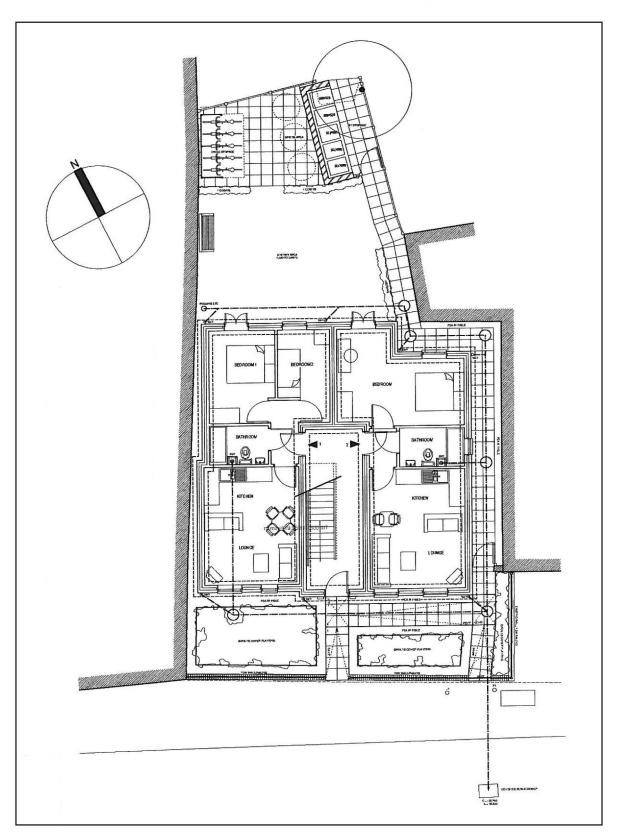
Plan of the new build showing foundation design (plan supplied by the developer). Not to scale.
